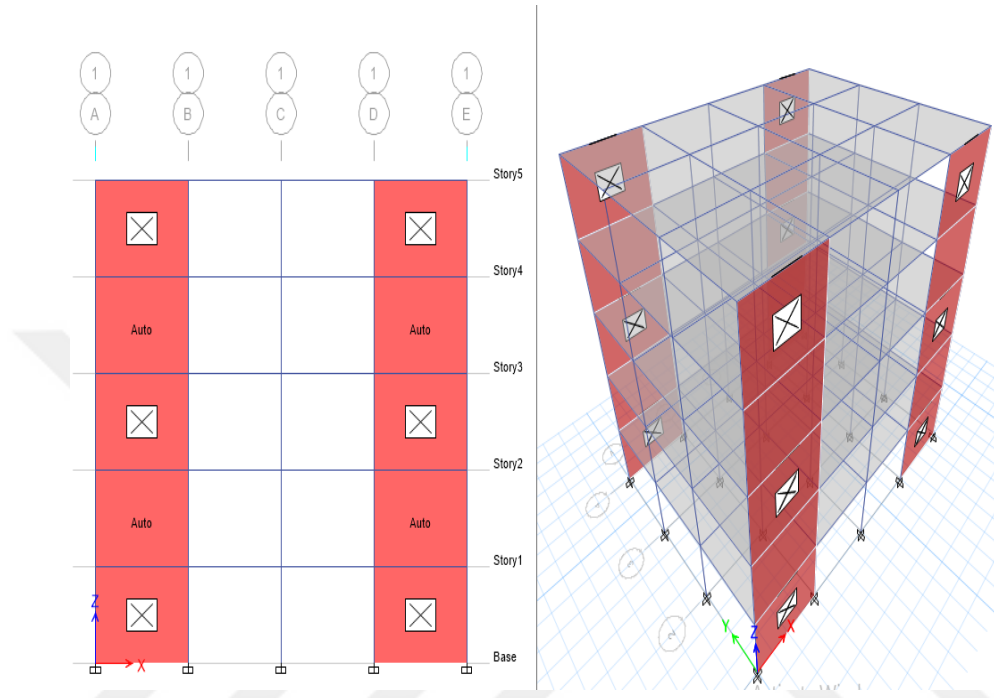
Geometric model of the 5-story building with alternately openings.
